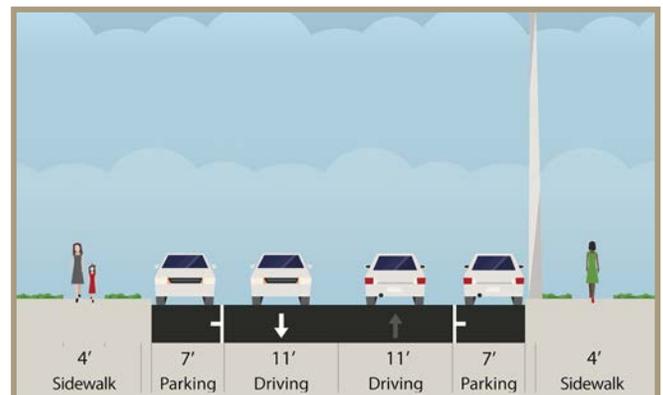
Looking east on Spruce Avenue east of Center Street, existing conditions.
